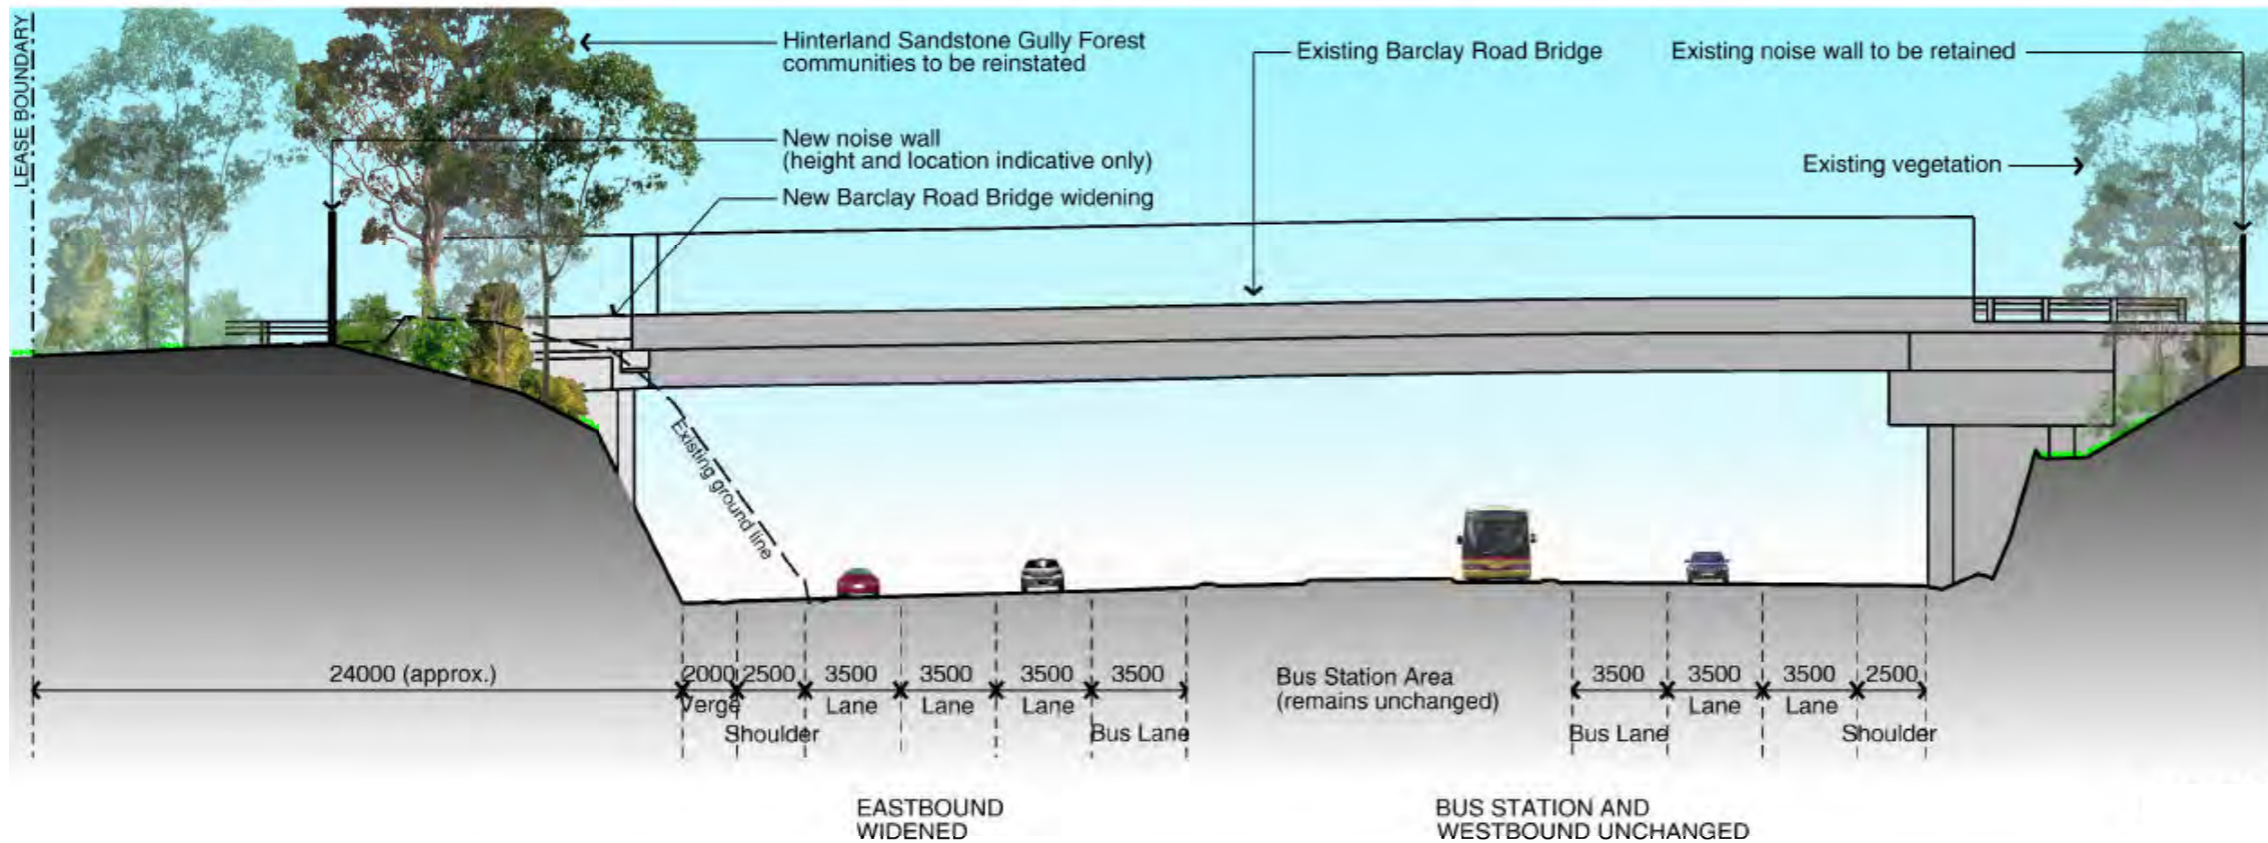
Stn 5550 Barclay Road Bridge - Proposed
